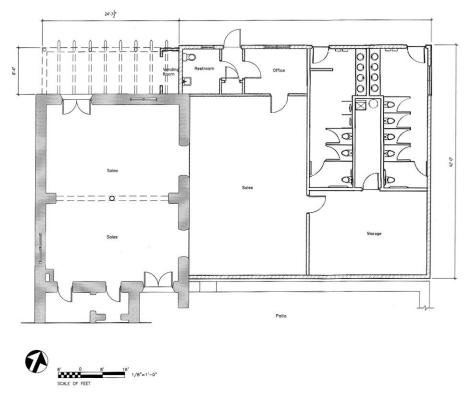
Floor plan of proposed restrooms within the non-historic warehouse (Alternative C).
